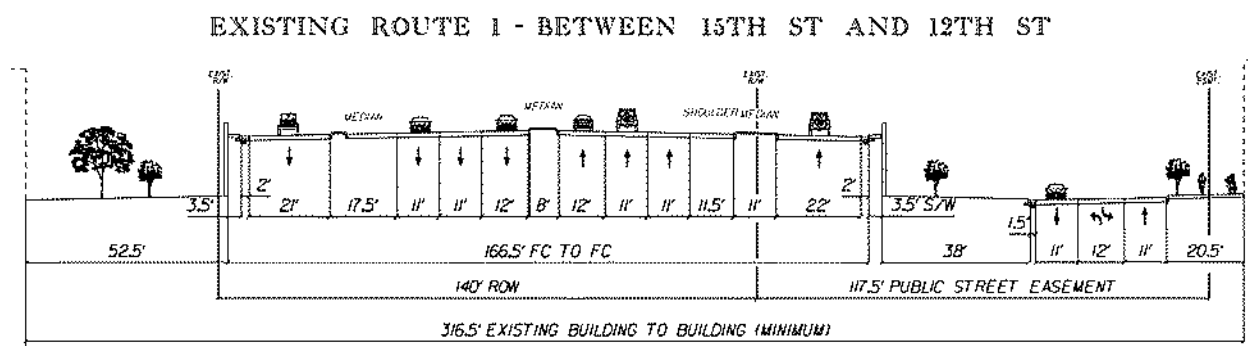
Existing Route 1 – Between 15th Street S and 12th Street S Cross Section (looking north)
